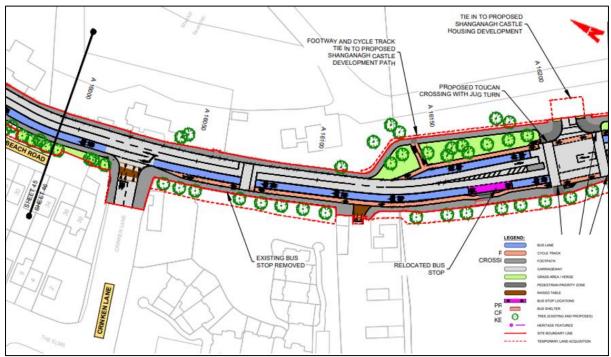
Extract from General Arrangement Drawing at Dublin Road (Sheet 46)
